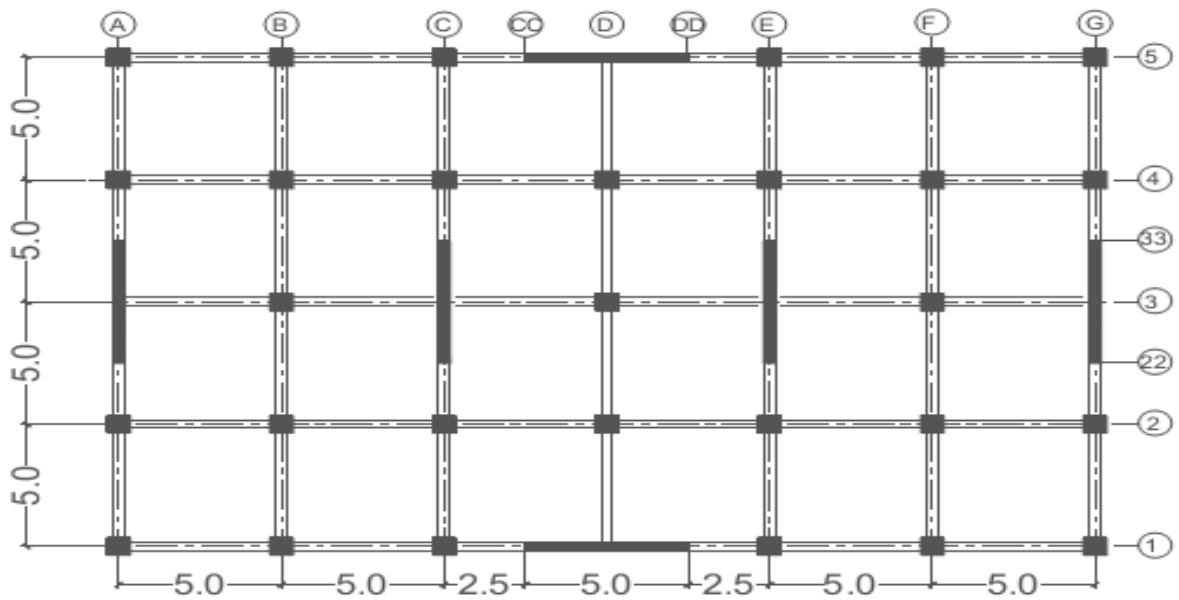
Typical structural layout of building Model 4 (G+20)
